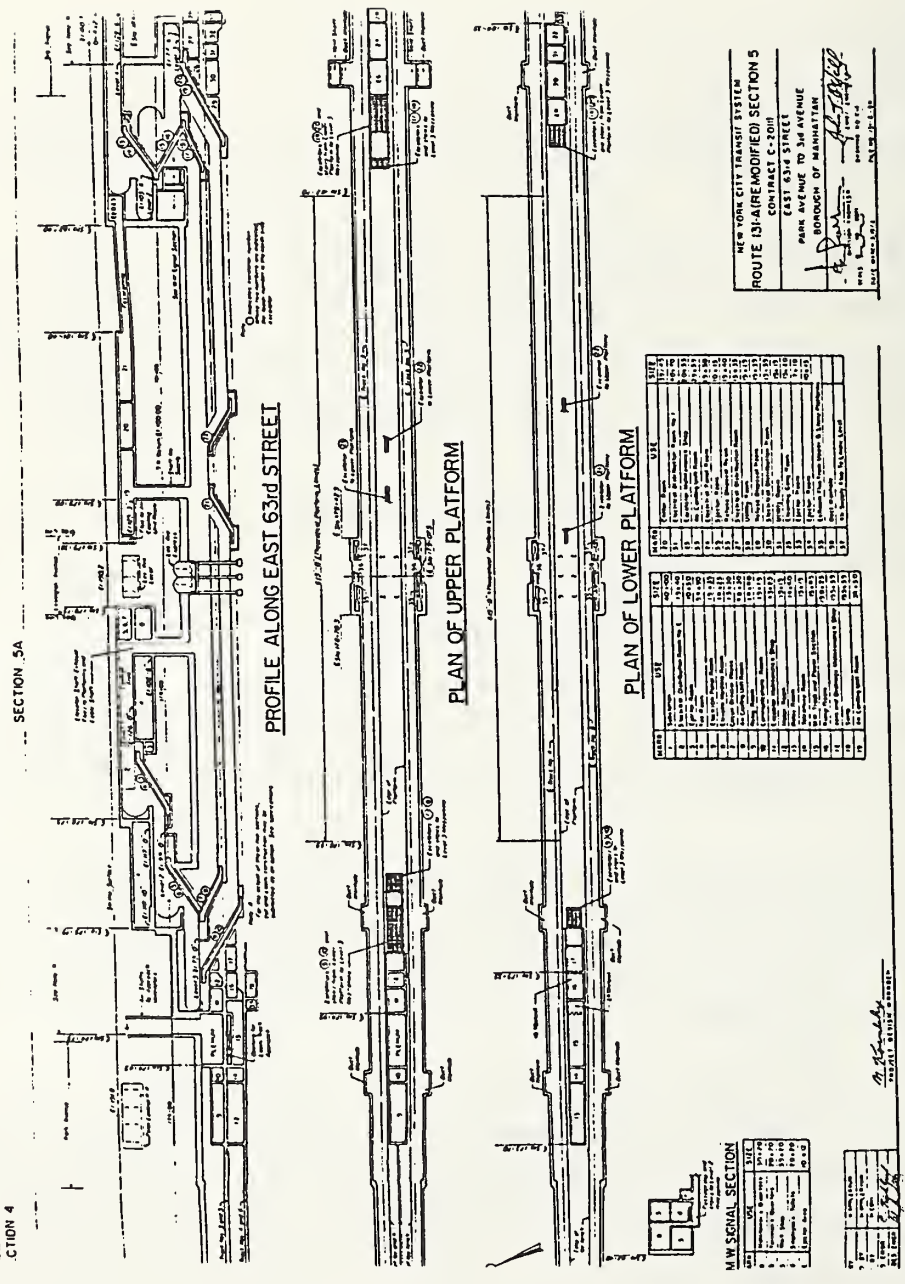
REMODIFIED PLAN (63RD STREET STATION)
